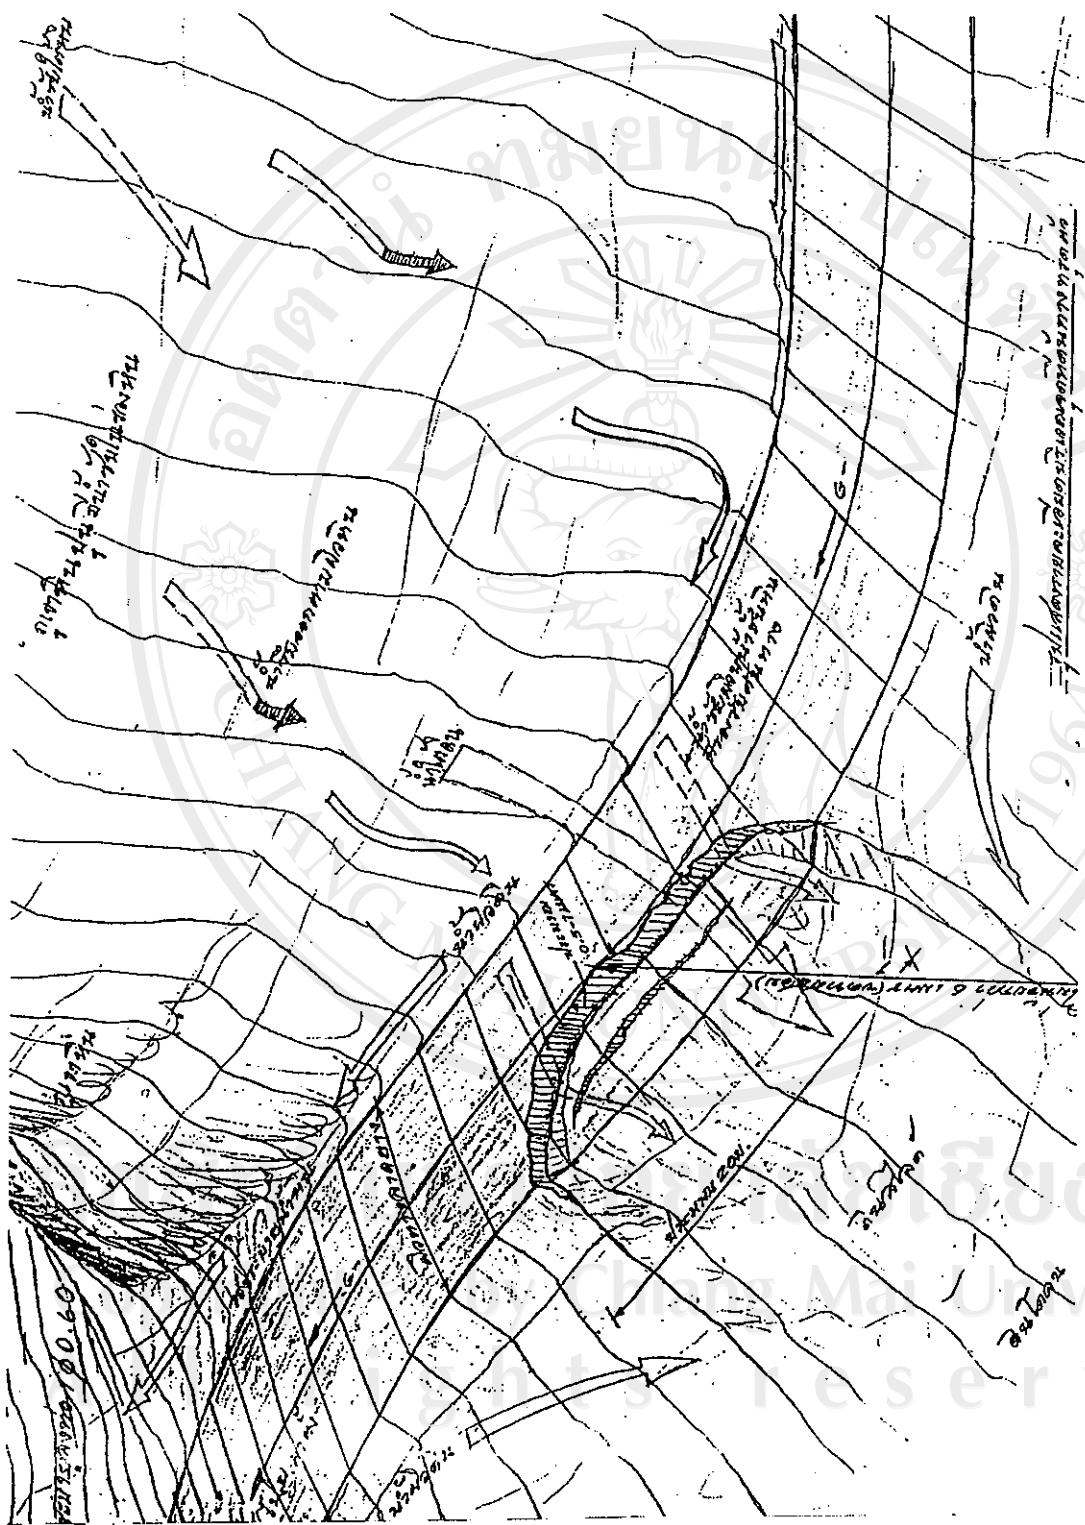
Sketch of failure slope at Km. 35+400 of Public highway no.1093
